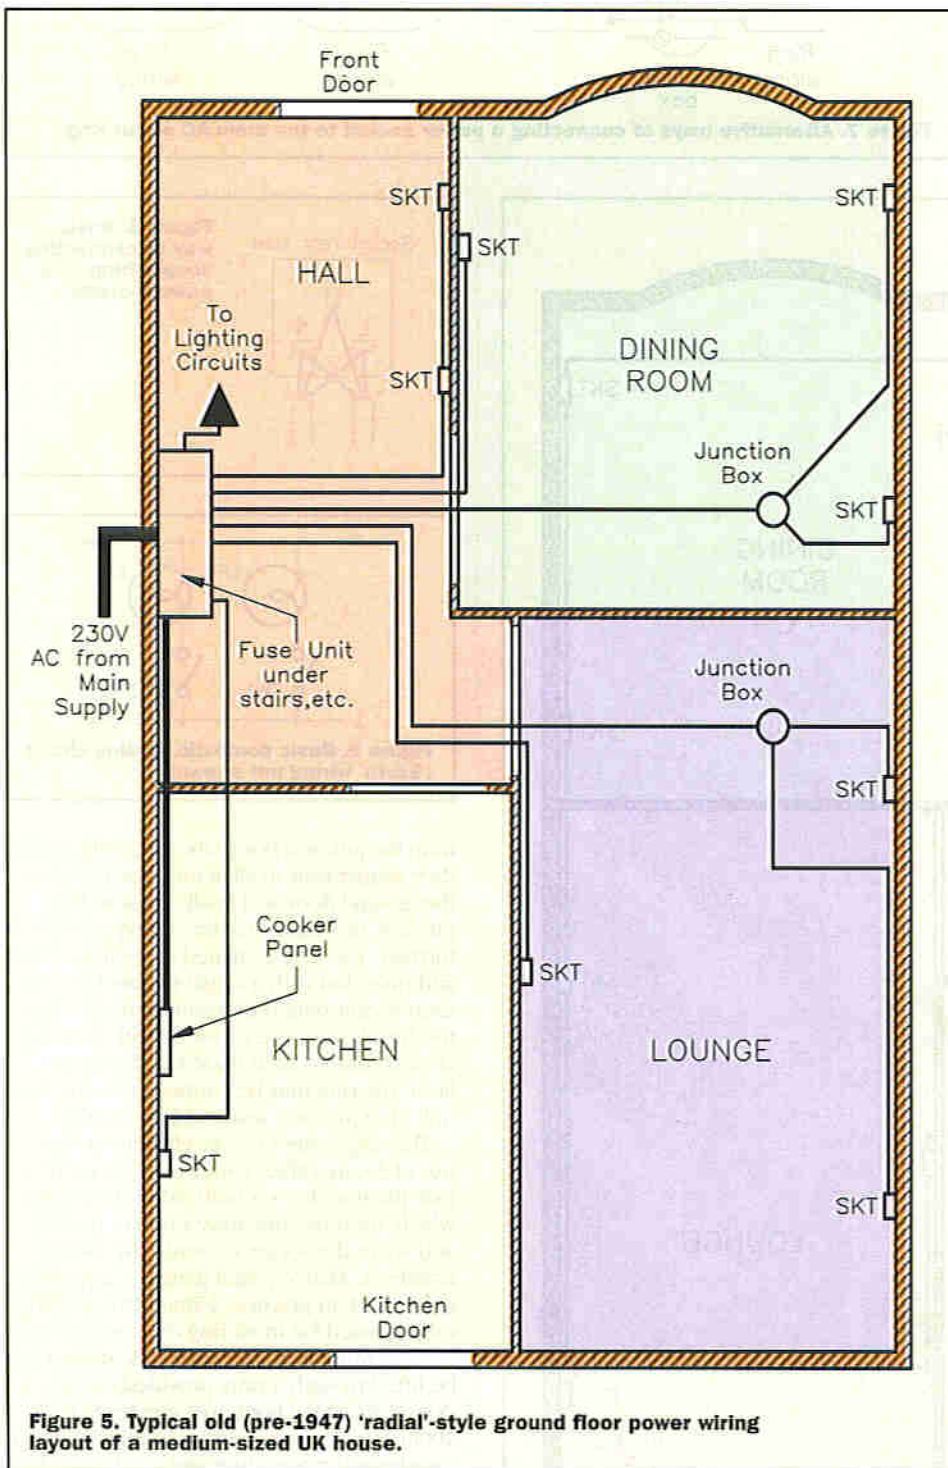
Typical old (pre-1947) 'radial'-style ground floor power wiring layout of a medium-sized UK house.
